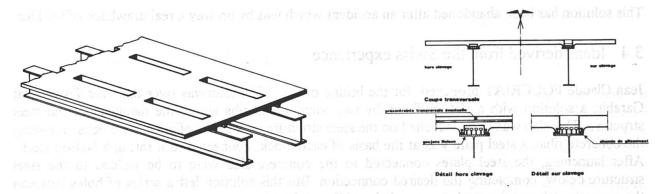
A precast concrete slab precast with a channel over the Neson studs and pockets for reinforcing and conreting.
